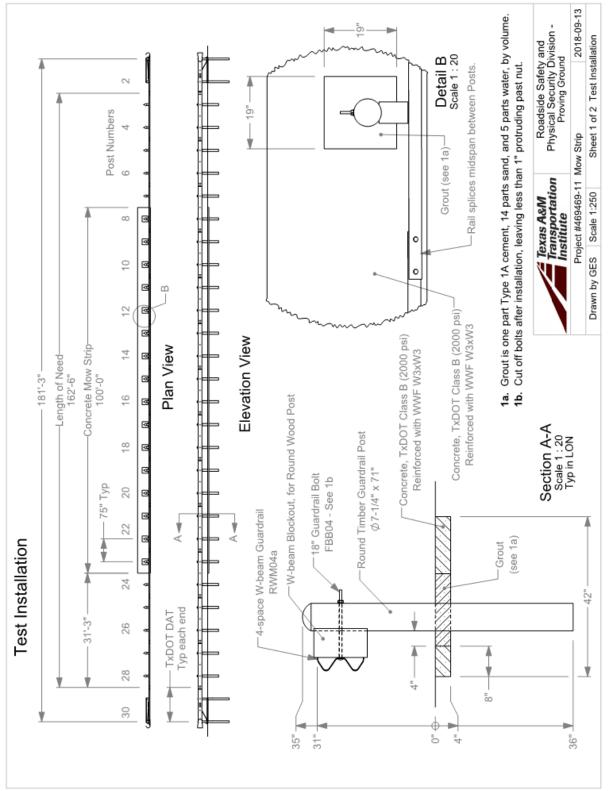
Overall Details of the Round Wood Post Guardrail in Concrete Mow Strip.
